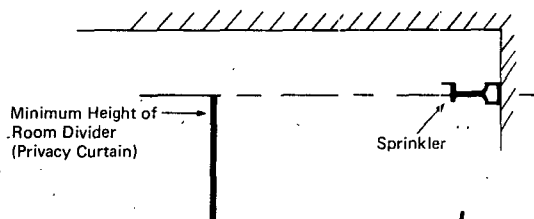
(b) Sidewall Sprinkler Installed Near Privacy Curtain
